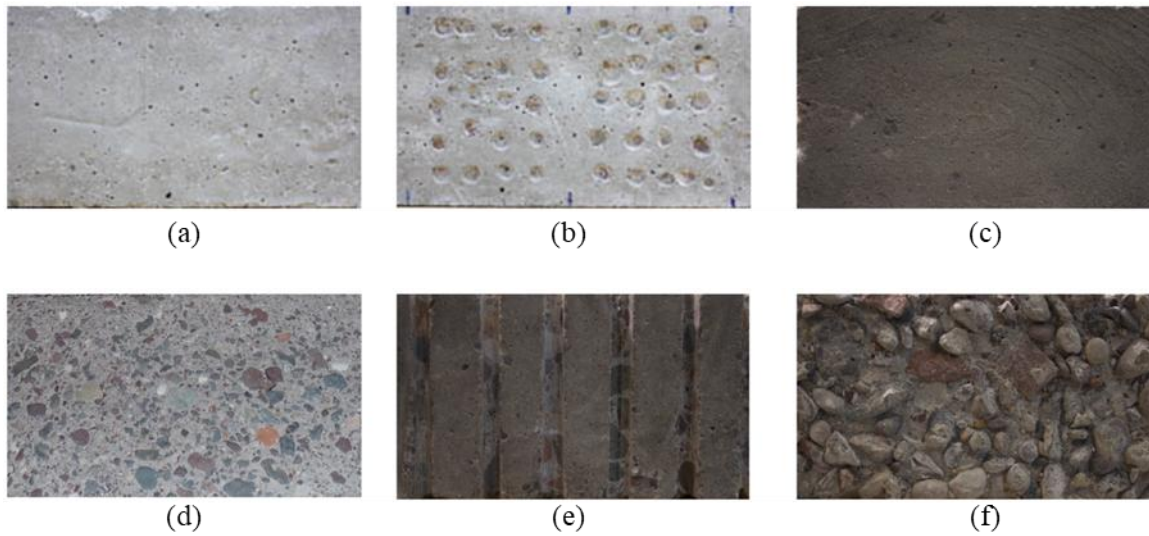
Typical surface finishes tested for CC-to-UHPC interfaces: (a) smooth, (b) chipped, (c) brushed, (d) sandblasted, (e) grooved, and (f) exposed aggregate, from Munoz et al. [49].
